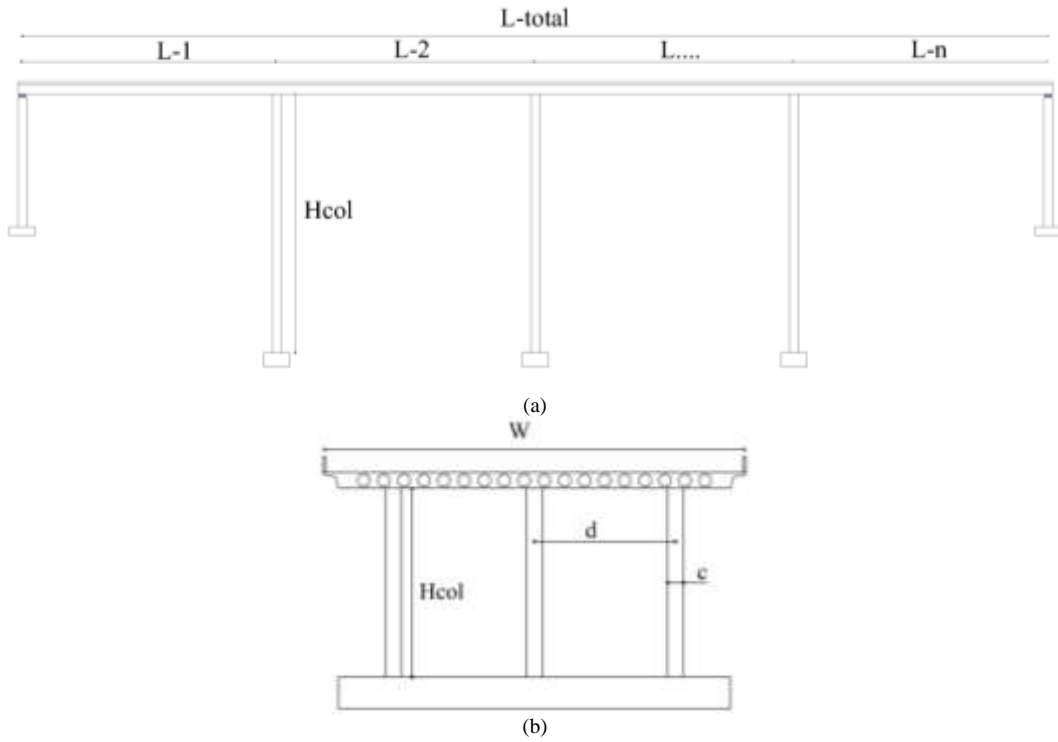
Geometry of the bridges (a) Longitudinal direction, (b) Transversal direction
